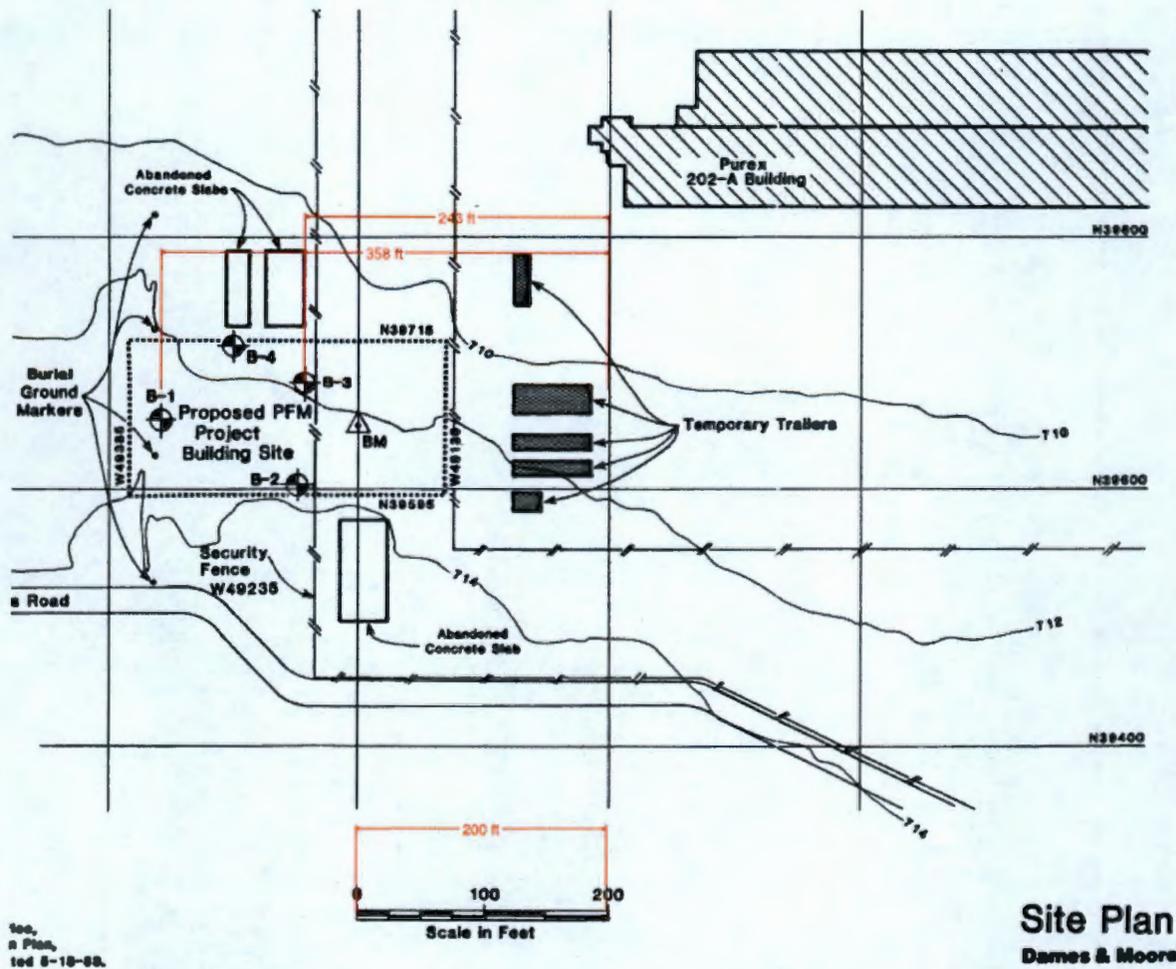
Dames & Moore Site Plan Showing Borehole Locations relative to PUREX Facility. PUREX storage tunnels are not shown in this view.
